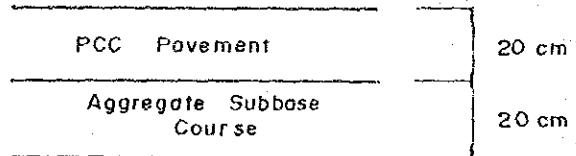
STANDARD PAVEMENT STRUCTURE
